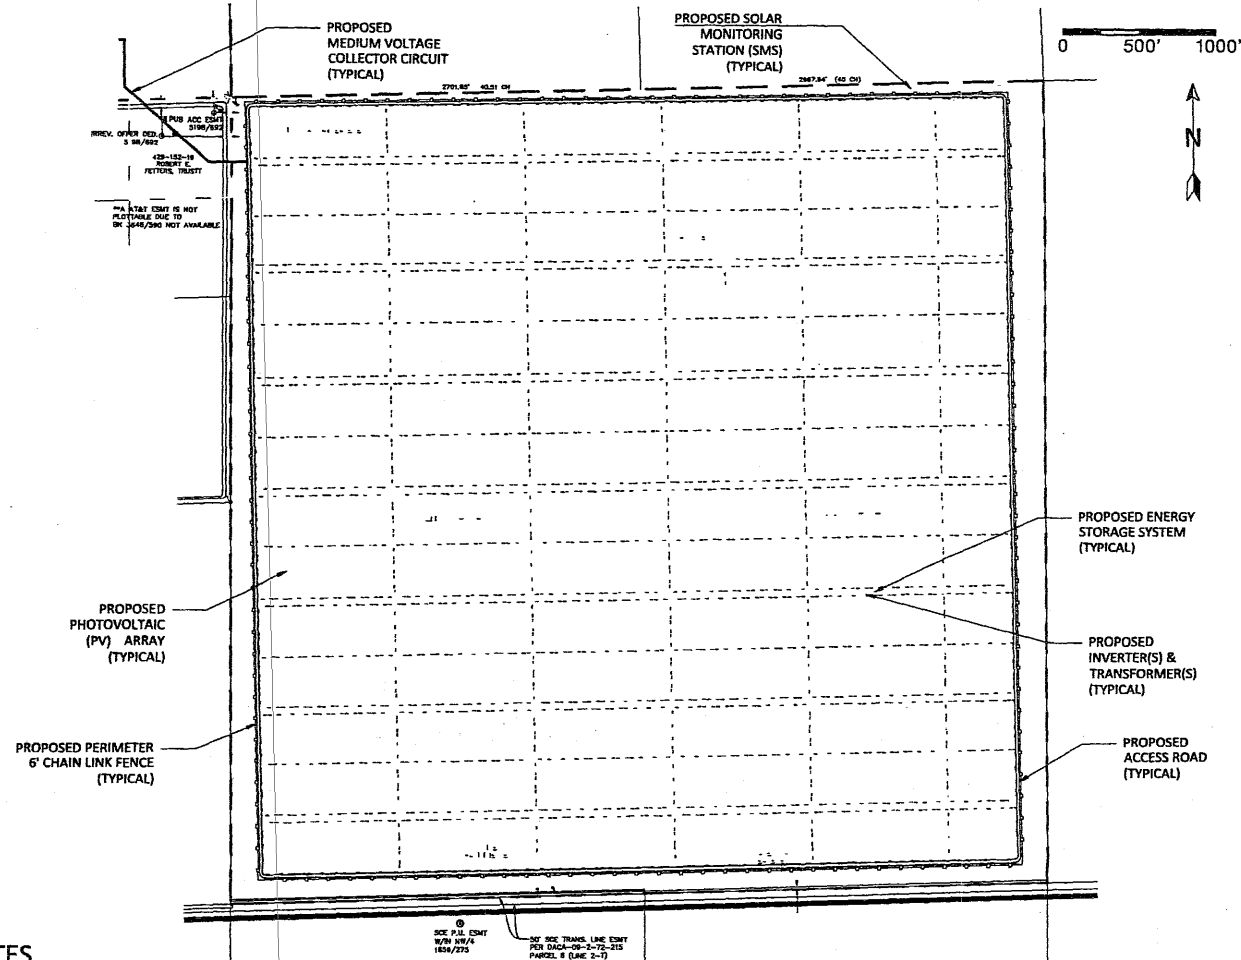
A: SOUTHERN SITE PLANS - PART 1
